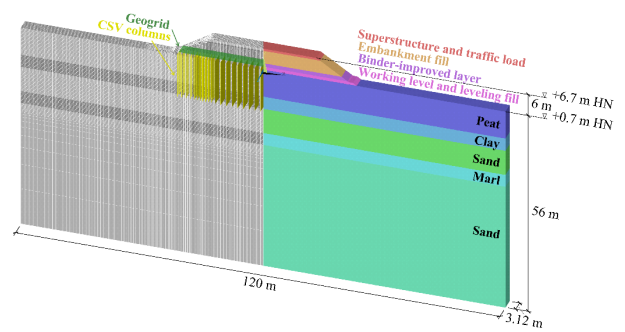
3D FE model of the BAB A 20 cross-section (Y-X plane)
